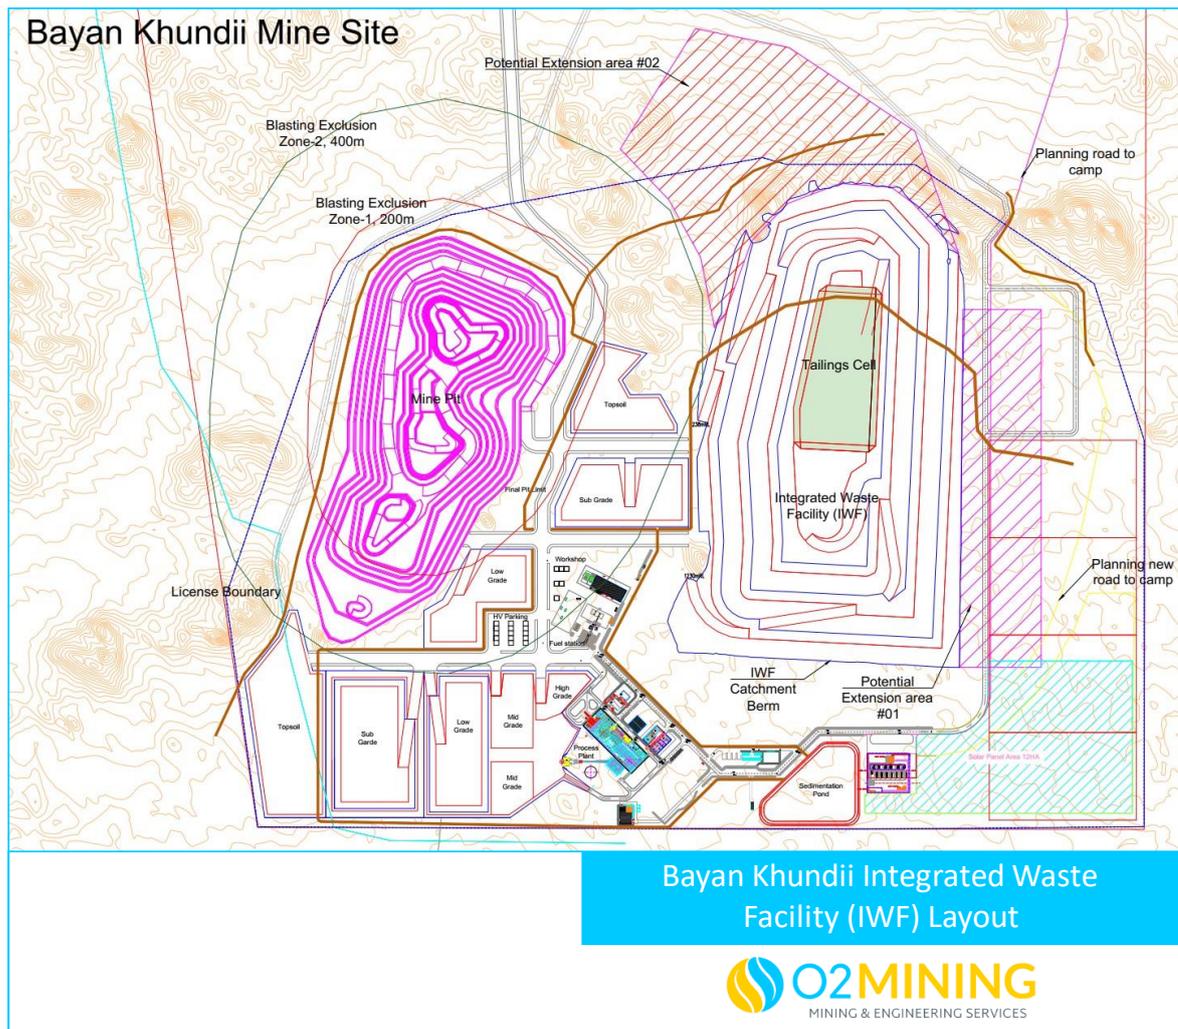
BK Integrated Waste Facility (“IWF”) Layout (Source O2 2023)
